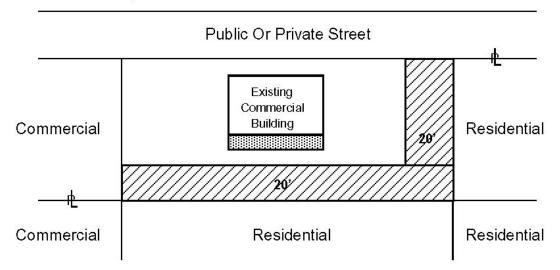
(continued) REQUIRED PERIMETER LANDSCAPING FOR BUILDING ADDITIONS
